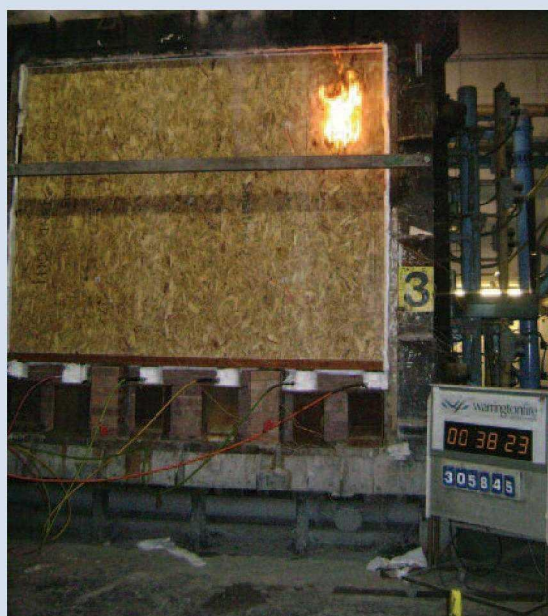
A timber frame wall construction insulated with PIR being tested to EN 1365-1: 1999
